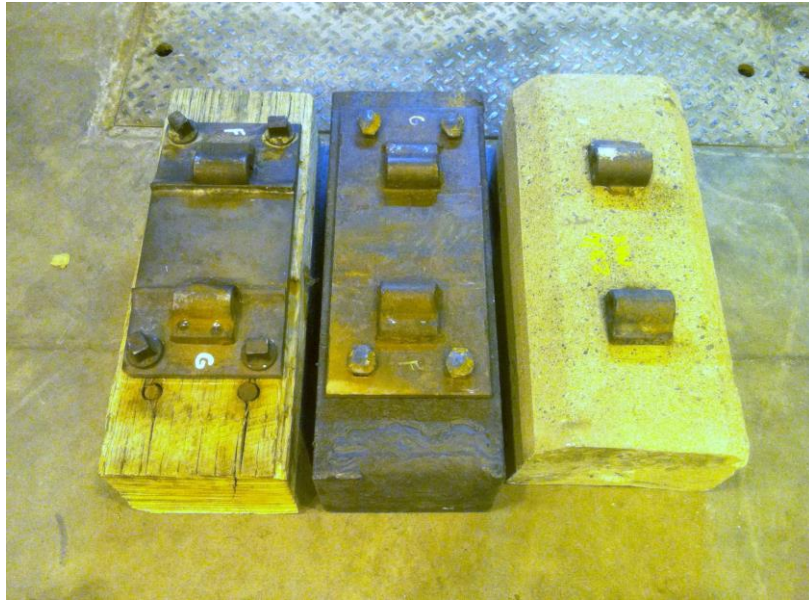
Three sections of tie used for laboratory ballast box testing
